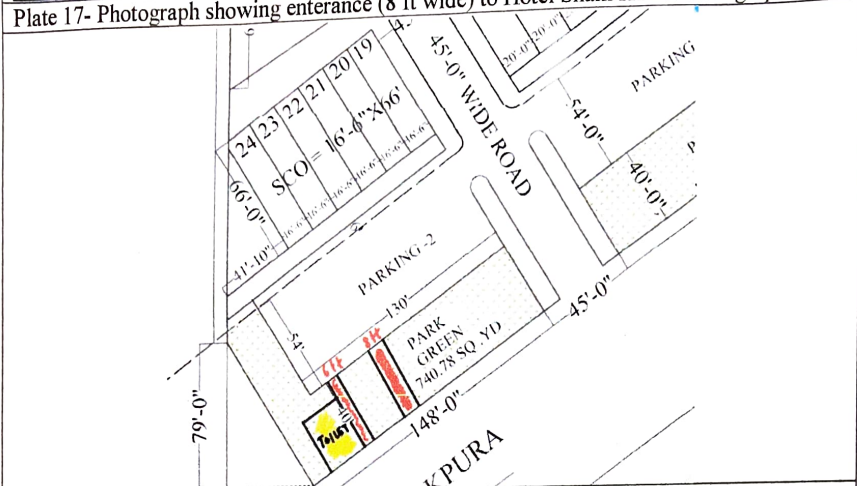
Map showing location of entrance to the Hotel (8 ft wide), toilet pavement (6 ft wide) and toilet in the park
